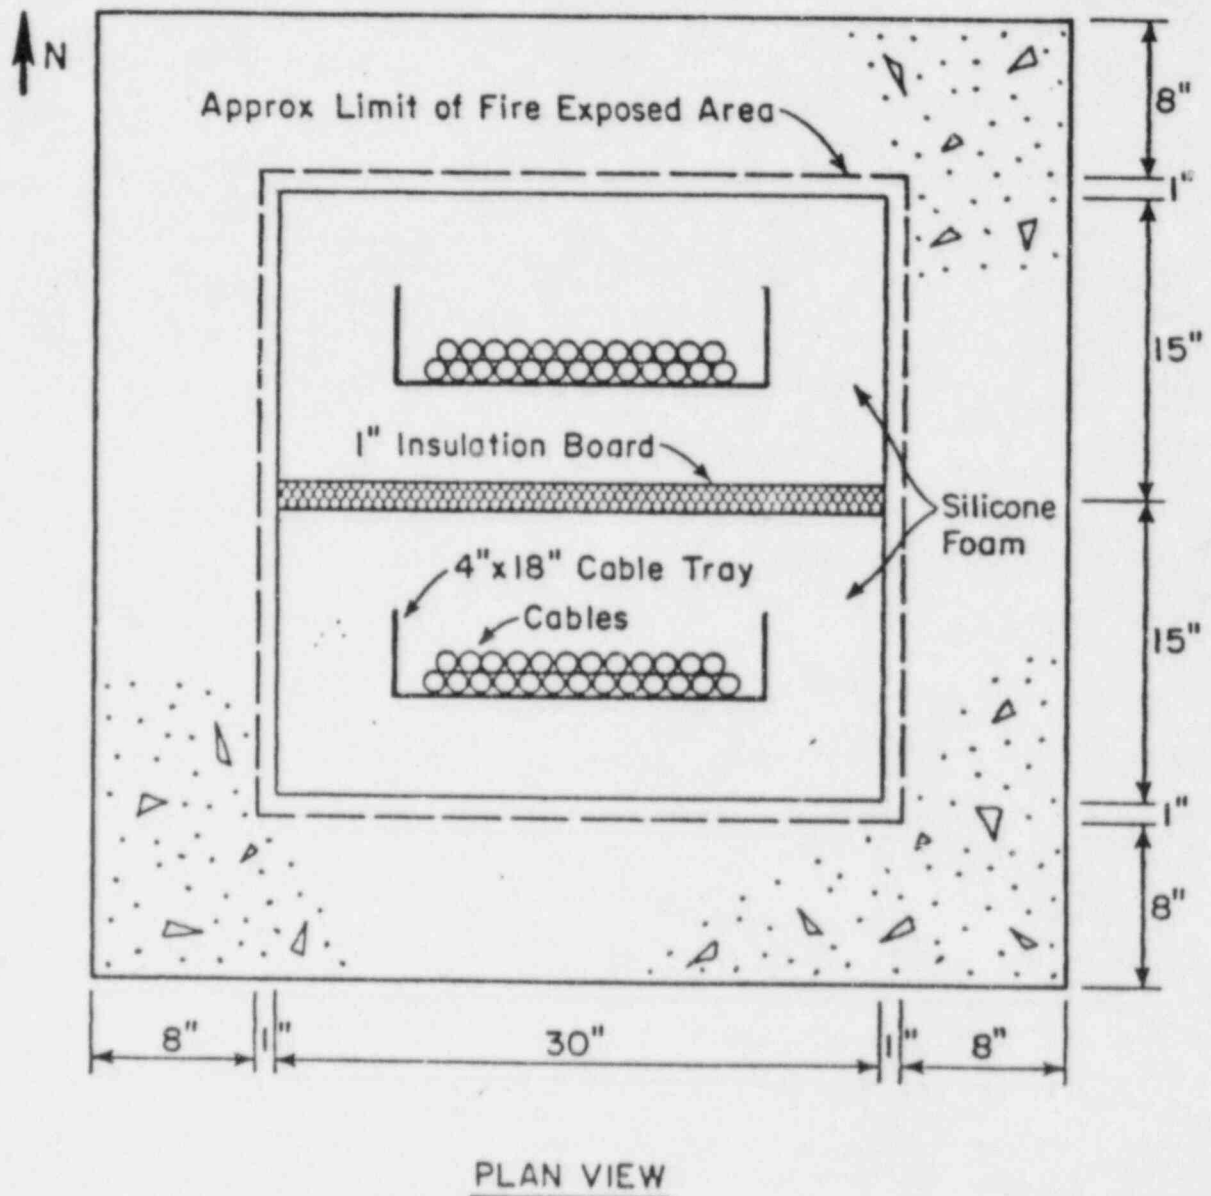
LAYOUT OF CONCRETE SLAB WITH TWO SILICONE FOAM SEALS AND PENETRATING CABLE TRAY ASSEMBLIES
